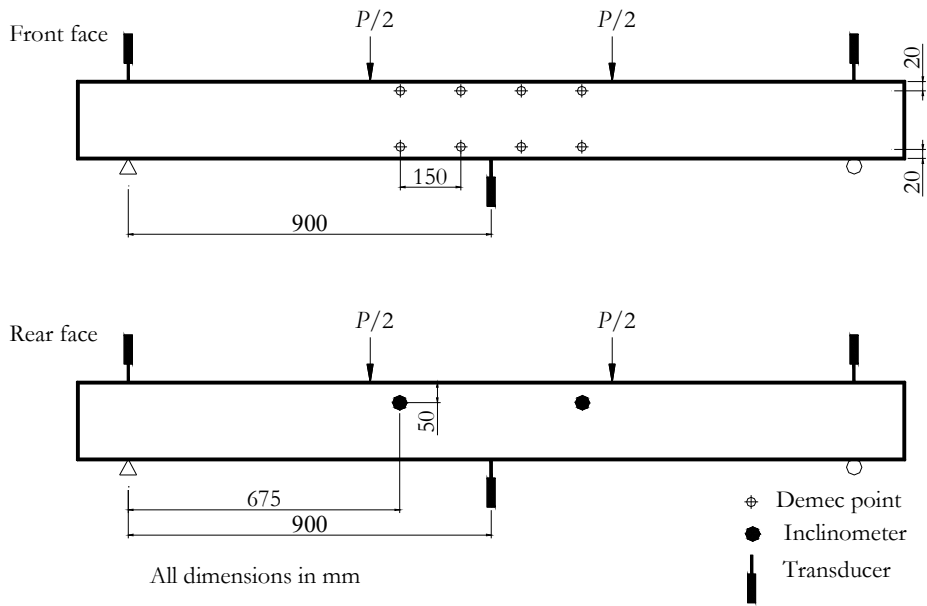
Instrumentation details for beam C2-316-D1-A.
